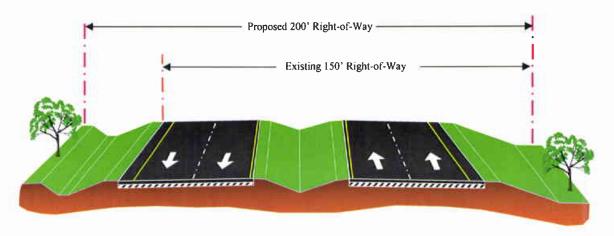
Proposed East Alignment Typical Section (Build Alternative 2)
